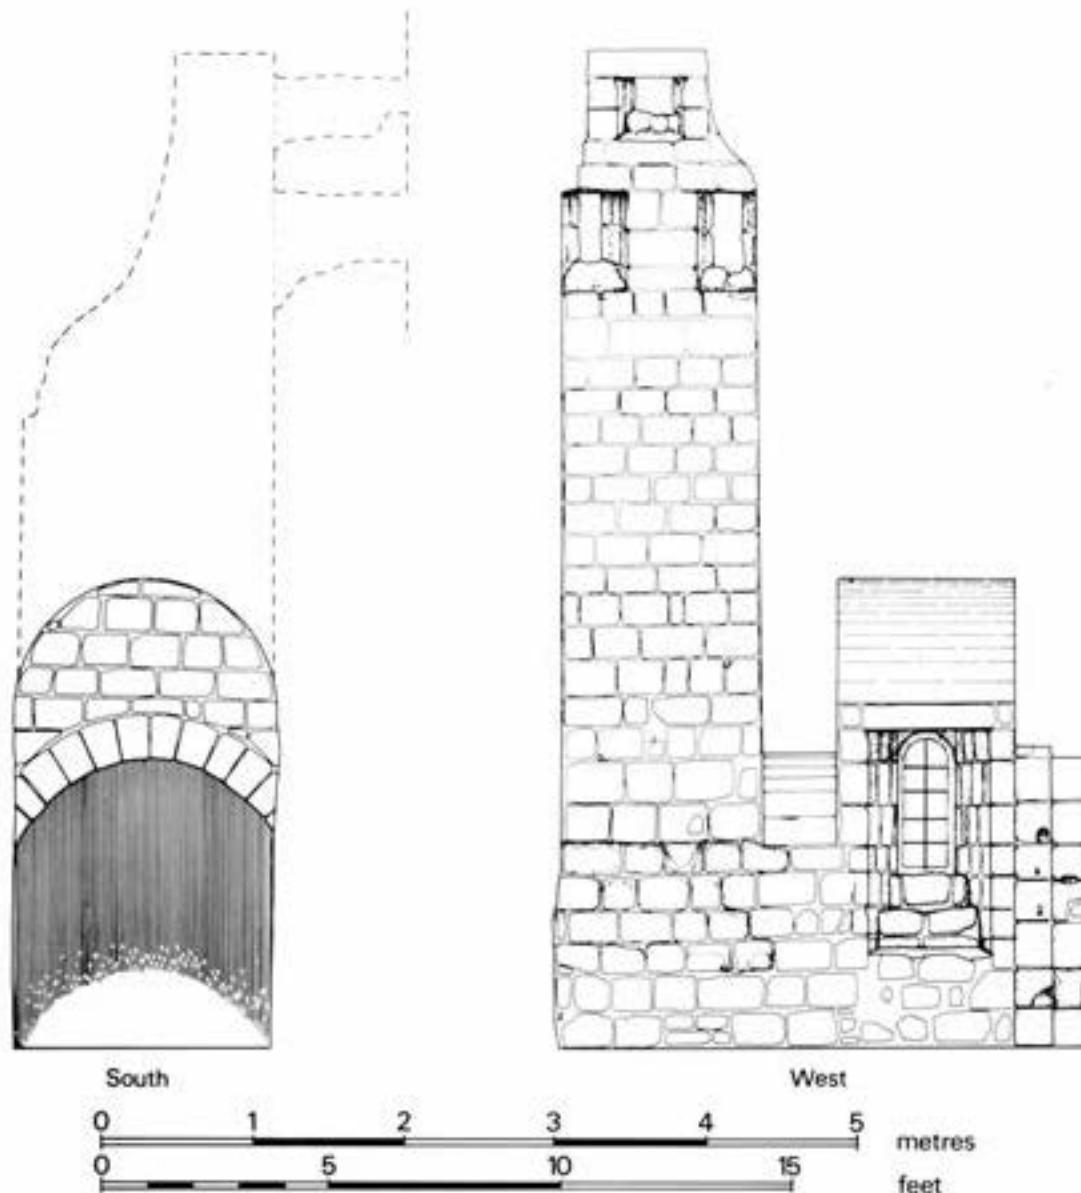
The keep; elevations in the second floor kitchen (room 19)
